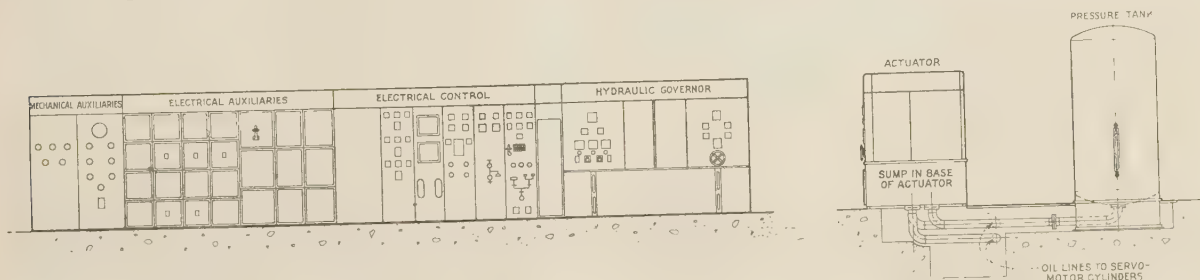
ARRANGEMENT OF CONTROL BOARDS AND GOVERNOR
